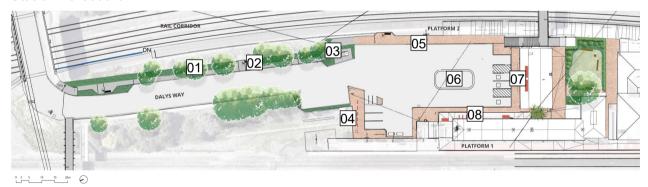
Proposed landscape plan for Station Forecourt (Source: Architectus, 2023).
